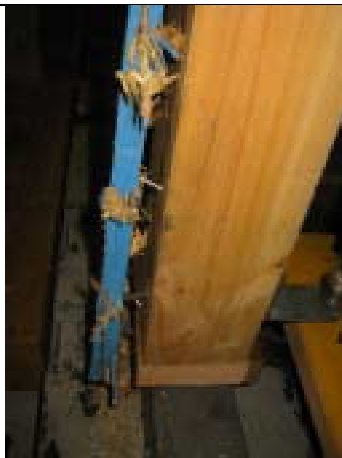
Edge tear, nail head pull through and nail yield. Wall 5.
